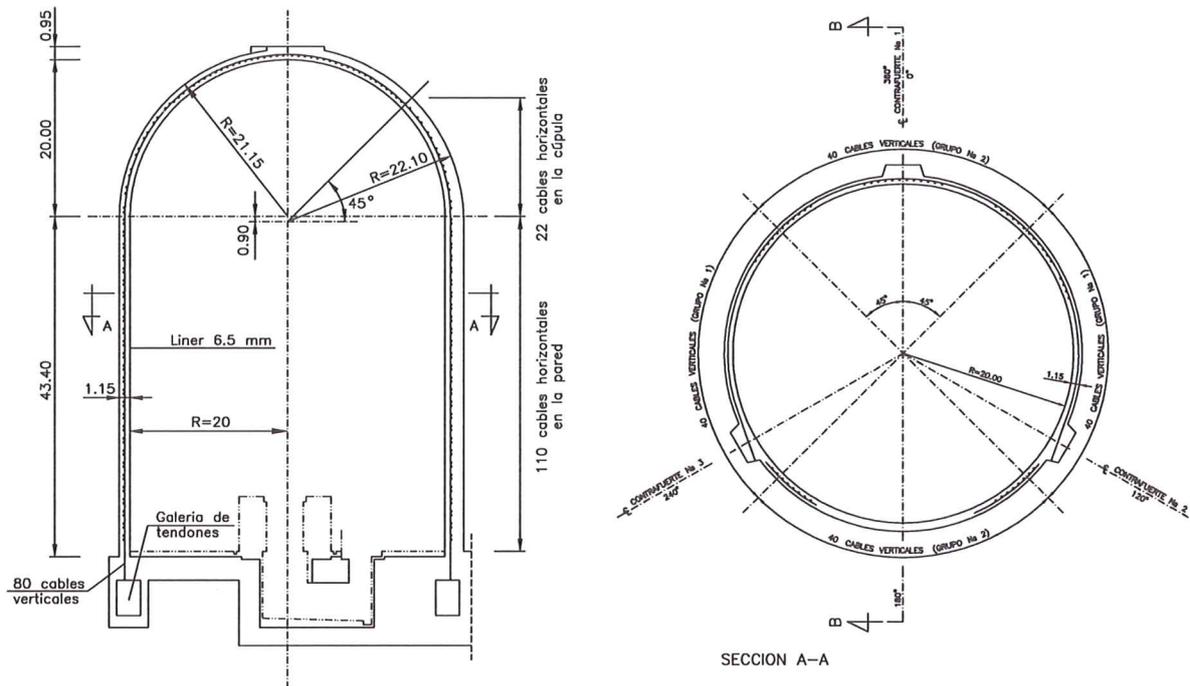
Containment shell. (a) vertical section; (b) horizontal section.
